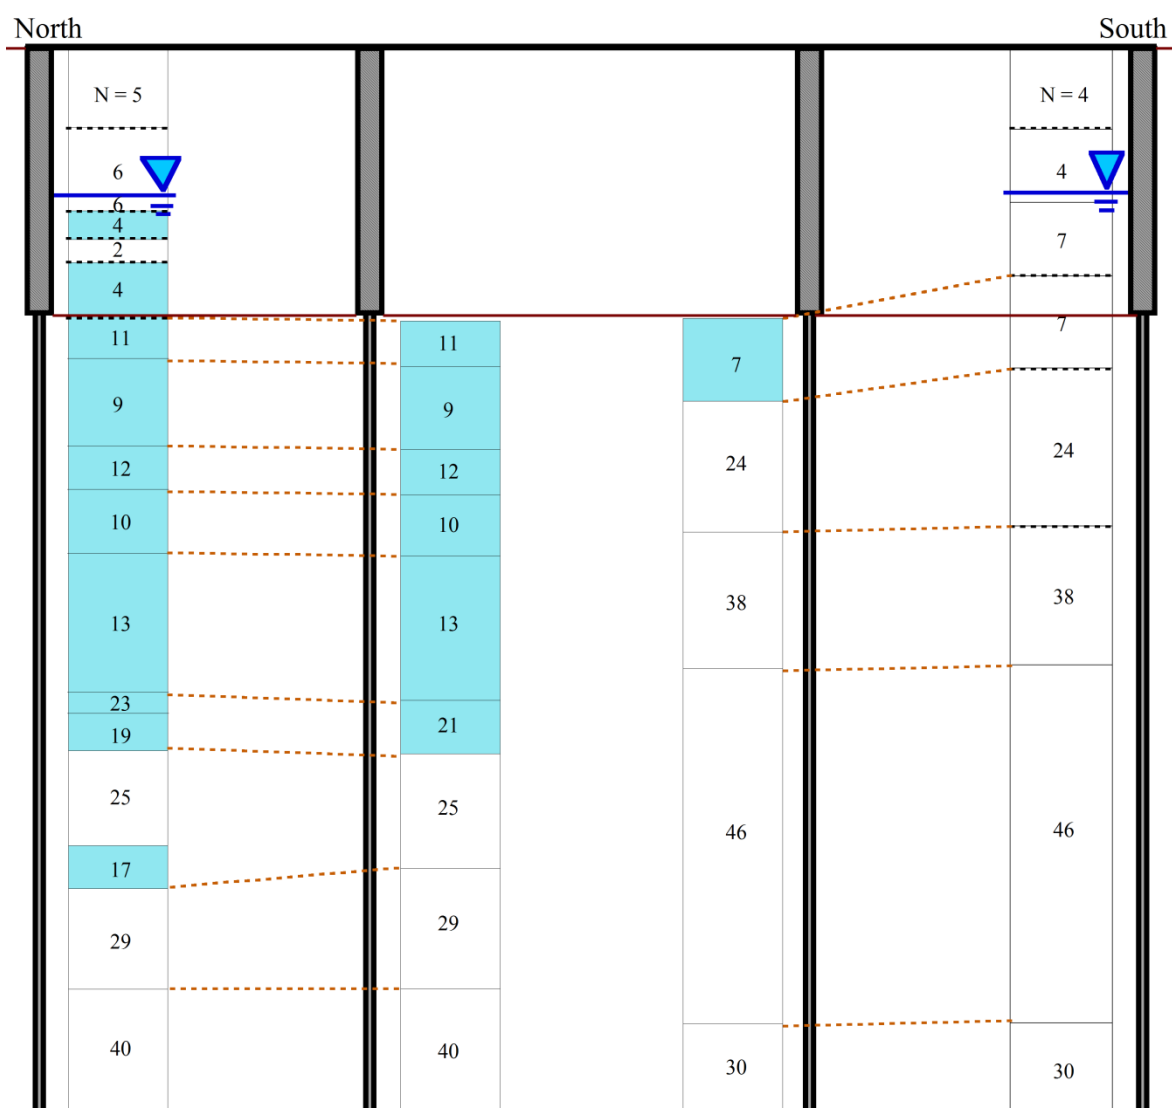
Dallington whole-bridge model assumed soil-spring columns
